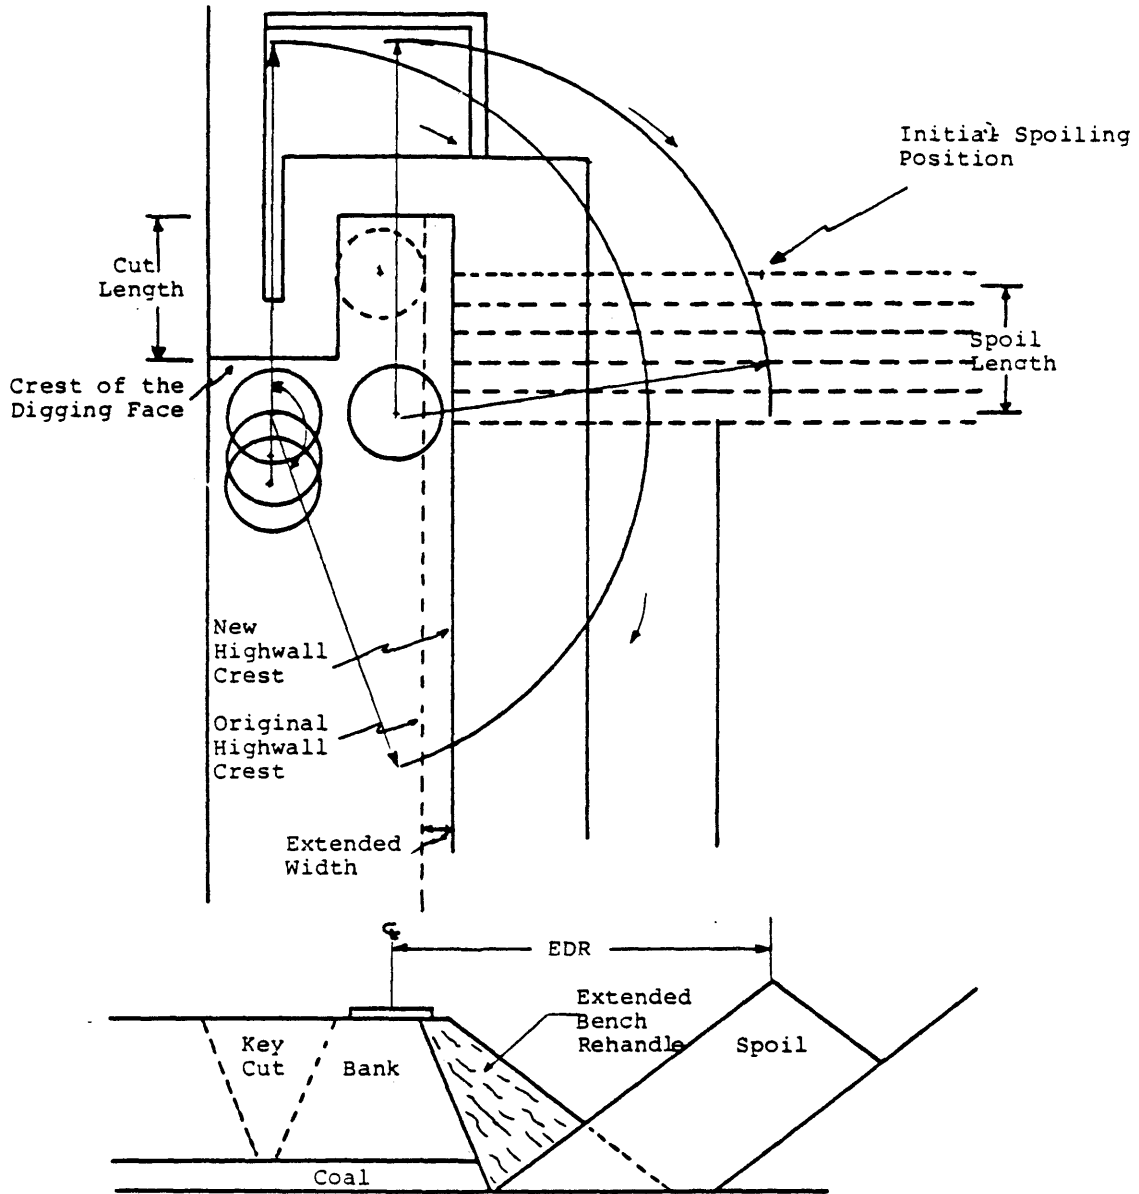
Plan and Section Views of Dragline Locations for Extended Bench Method.
